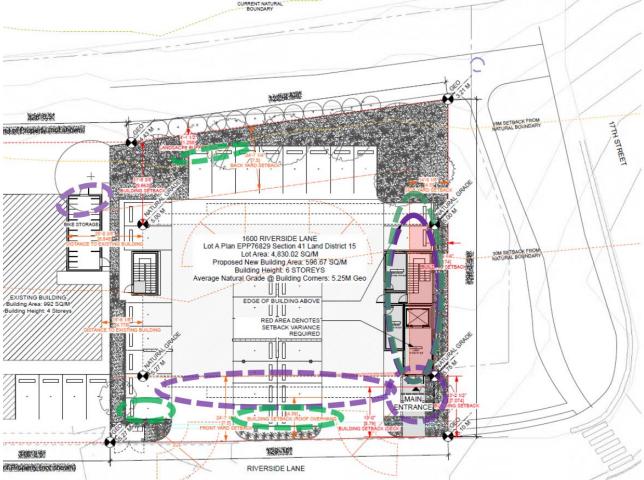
Site Plan Showing Building Setback (purple dashed) and Landscape (green dashed) Variance Locations
